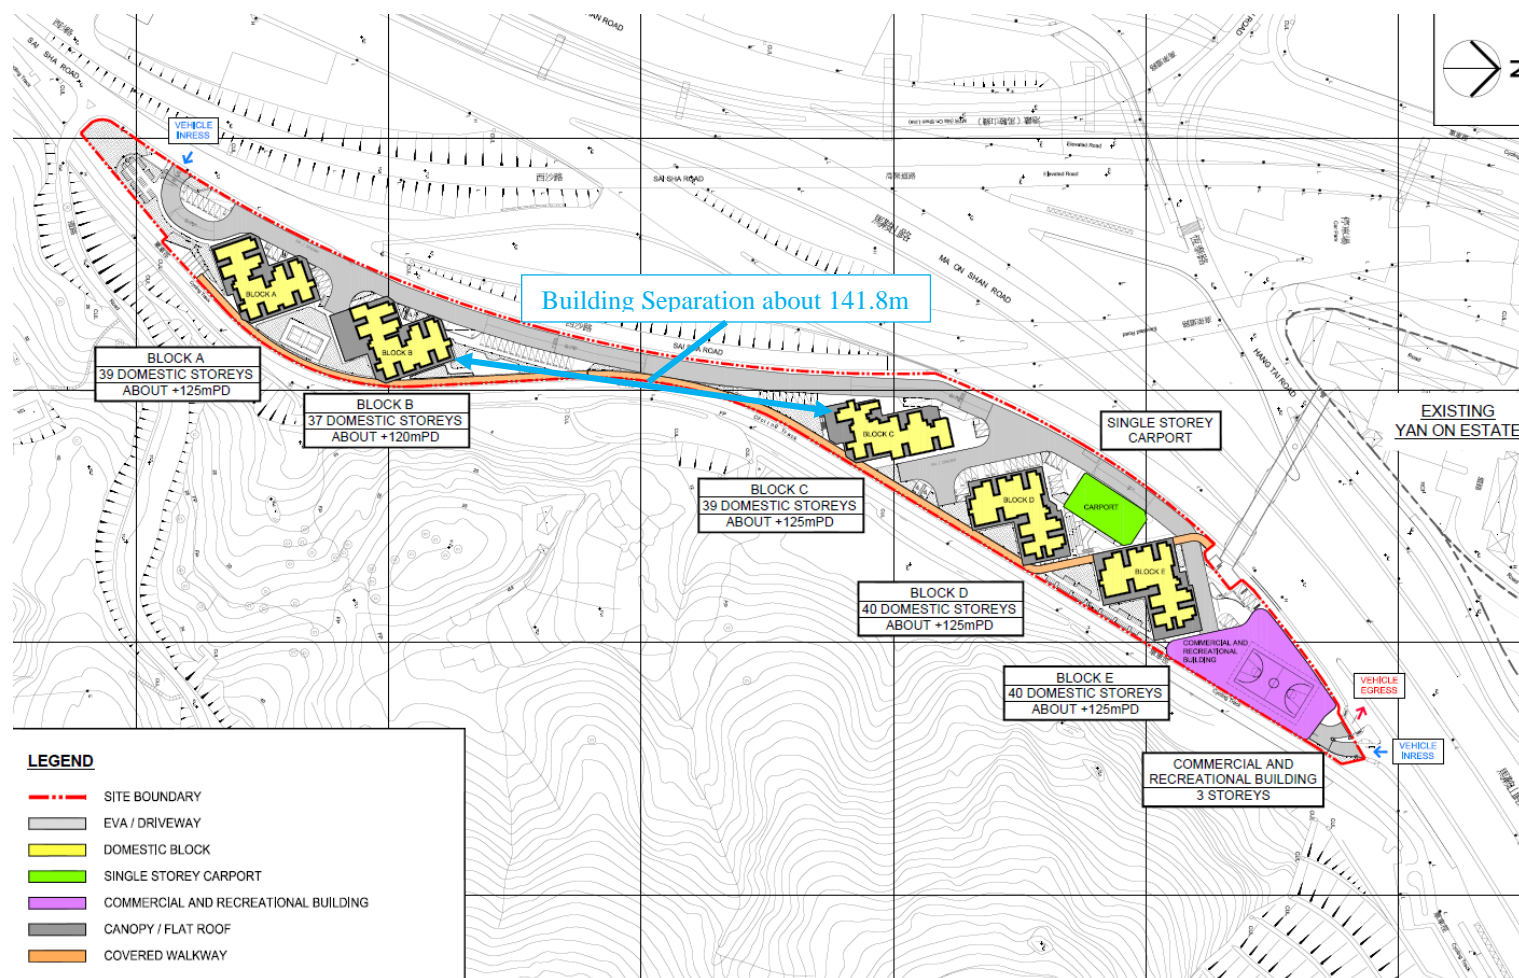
Building Separation in Proposed Scheme Master Layout Plan
